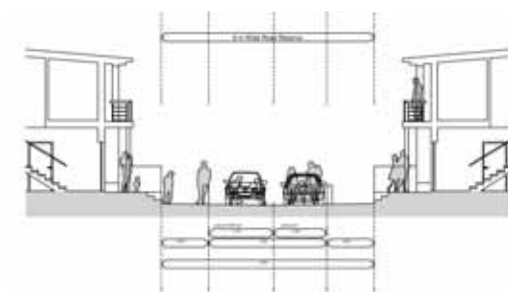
TYPICAL LOWER ORDER STREETS PLANS AND SECTIONS
